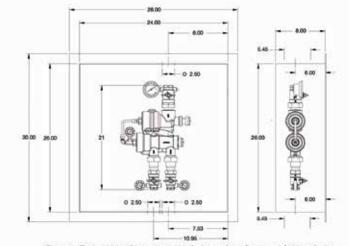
Typical Valve Dimensions with Stainless Steel Recessed Cabinet Option
